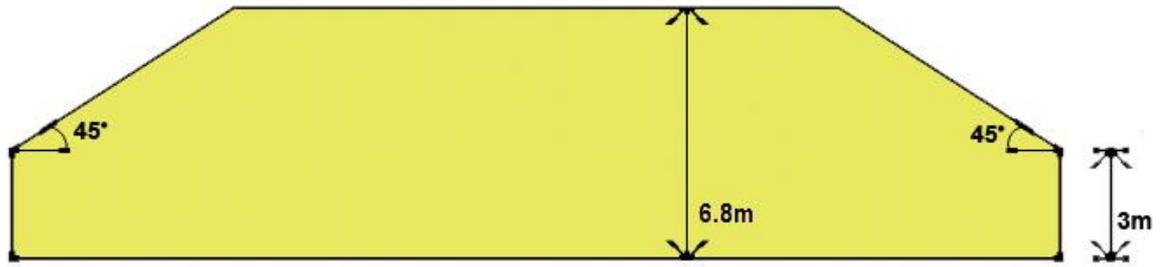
Building envelope required by DOR-P1.6.3 A1(b)
